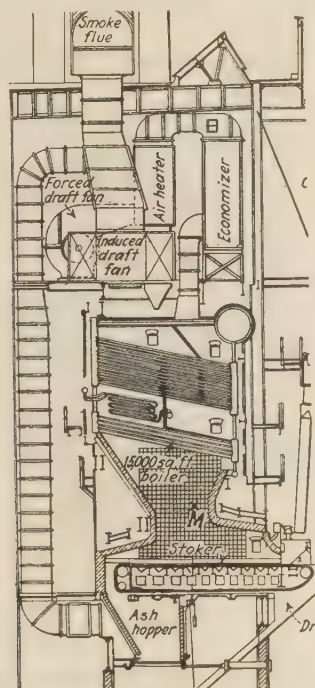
BOILER COOLED ON TWO SIDES OF FURNACE AND FIRED BY CHAIN-GRATE STOKER
